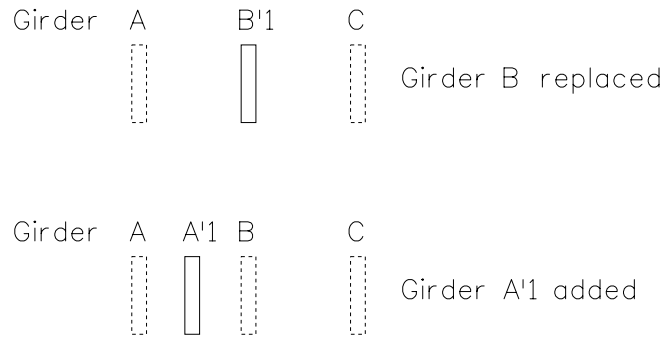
Structure Component Naming Convention for New Girder Added or Replaced
